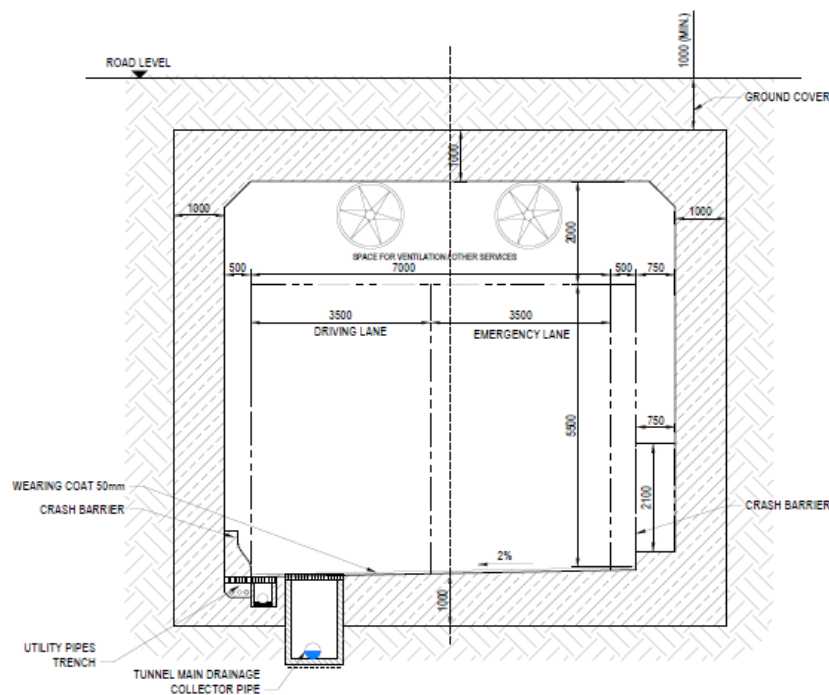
Typical Cross Section C&C Structure (2 LANE)
